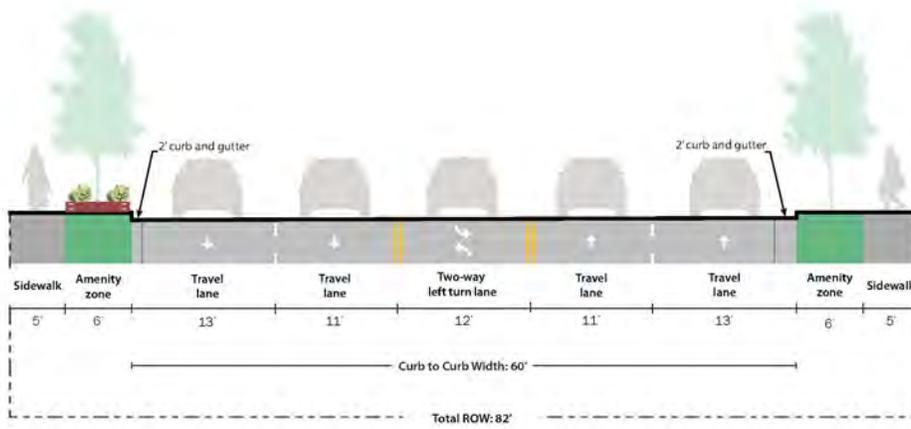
Section I (72nd Avenue West of Clay Street – Looking East)
